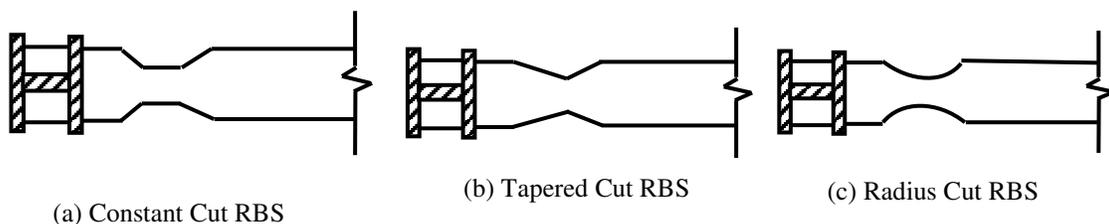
Types of Reduced Beam Section (RBS) Connections
